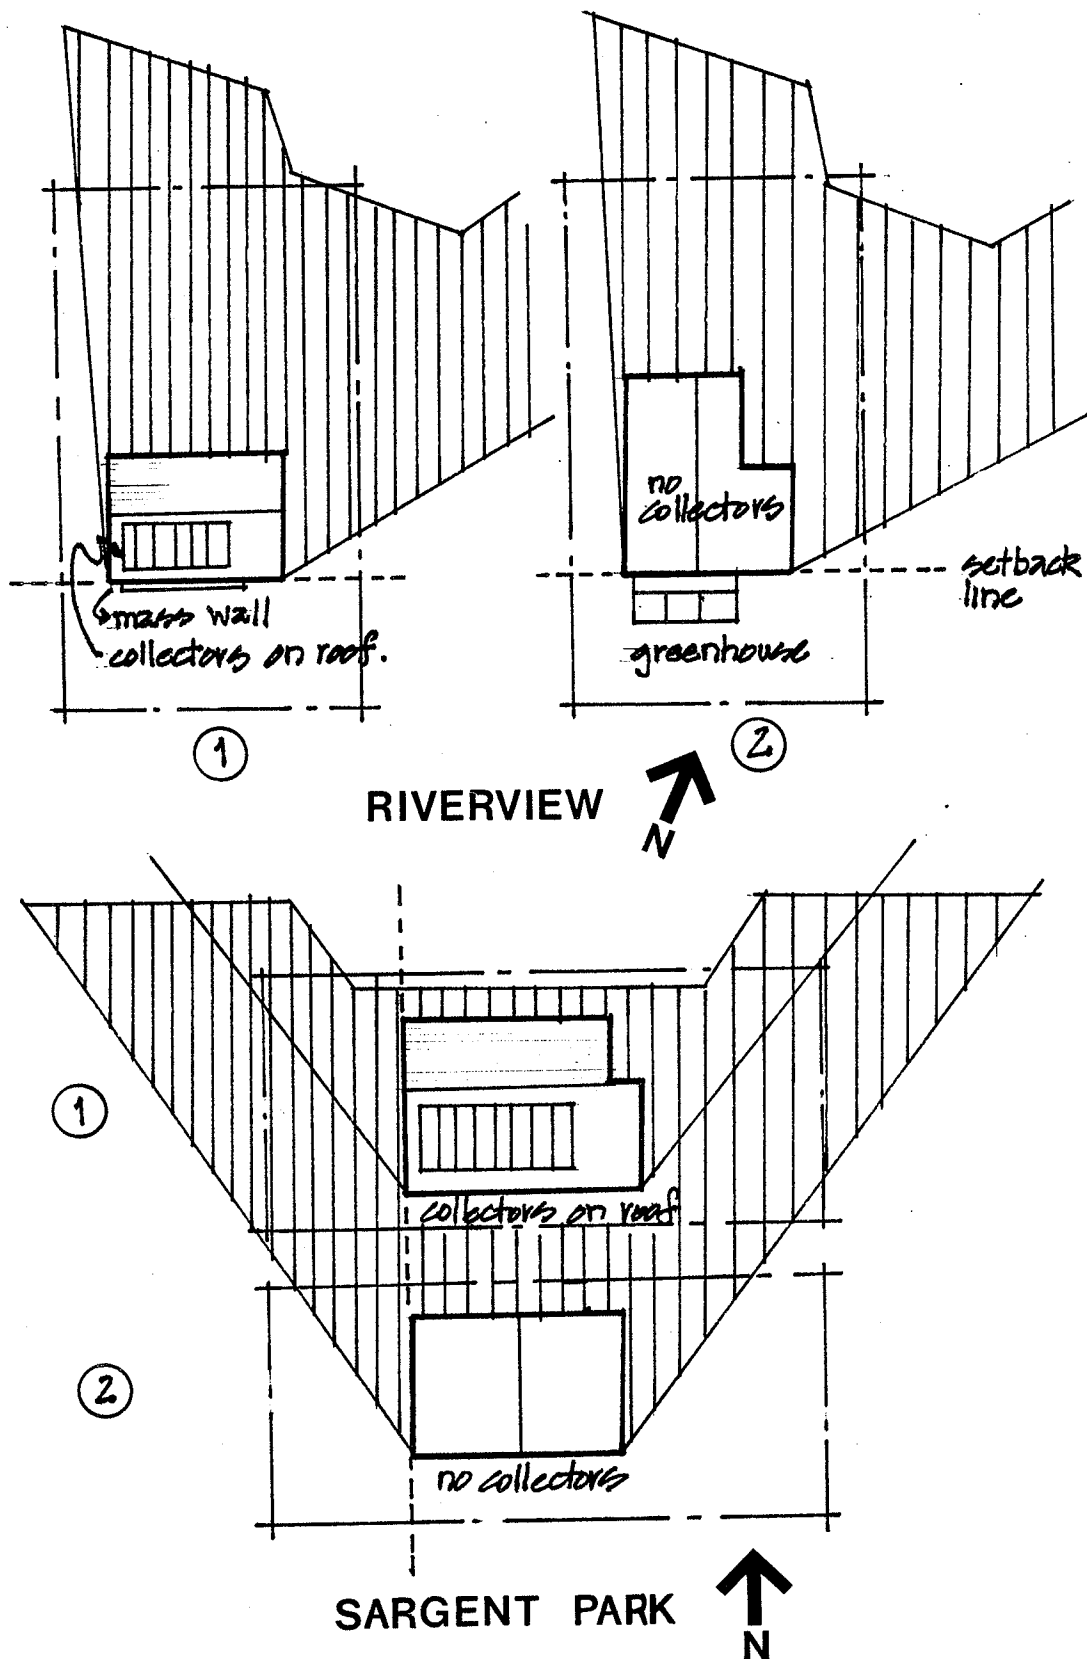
POTENTIAL FOR SOLAR COLLECTION: ROOF FORM VS. ORIENTATION
